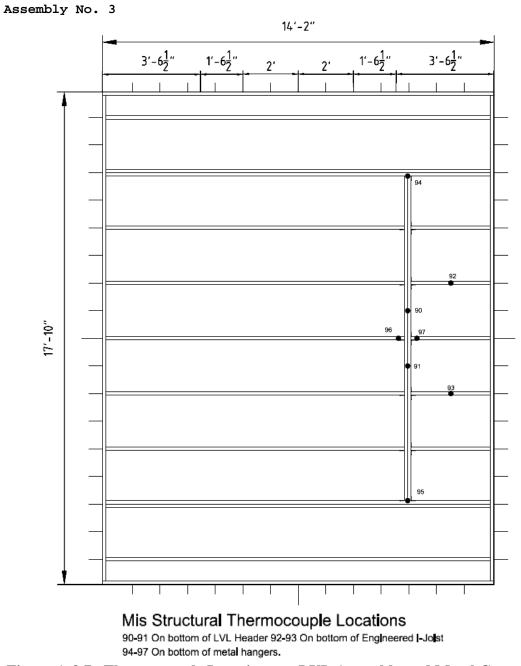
Thermocouple Locations on LVL Assembly and Metal Connectors.
